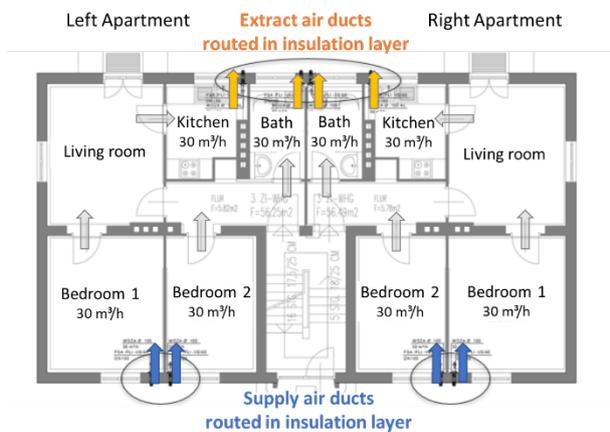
Floor plan of one of the case studies where all supply and extract air ducts are integrated in the external wall insulation. Note that the living rooms are ventilated with overflowing air (extended cascade principle).
